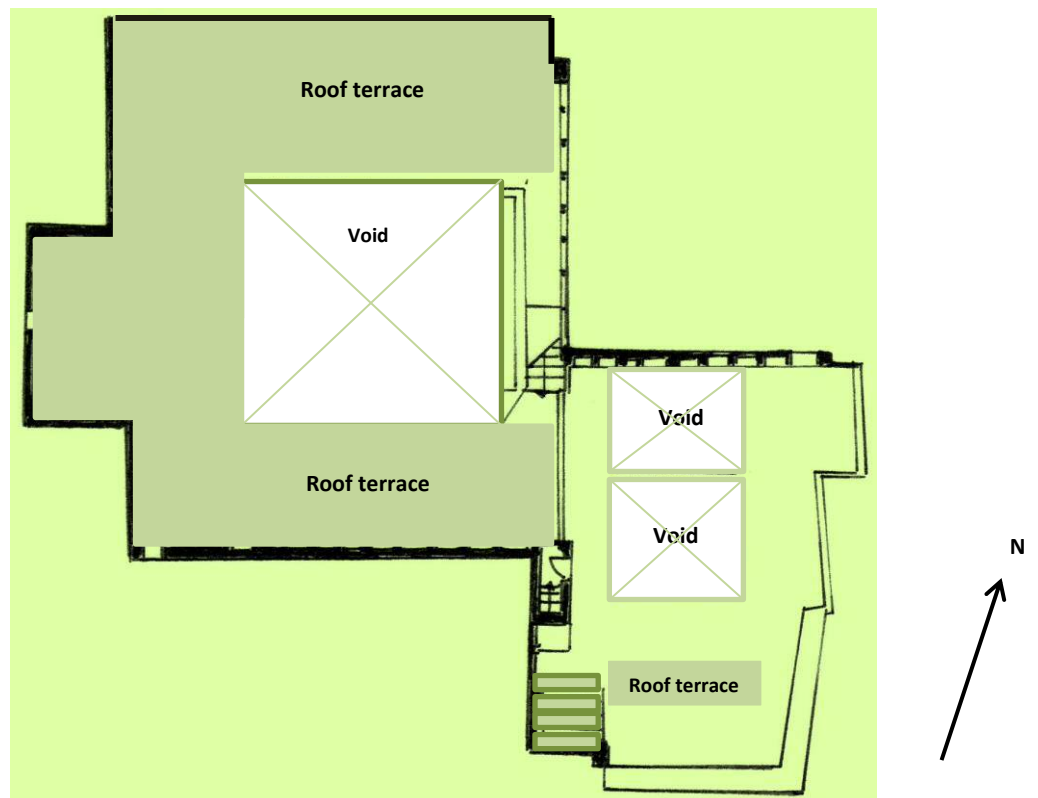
Roof terrace level plan of the traditional courtyard house No. 4. Scale: 1:50
